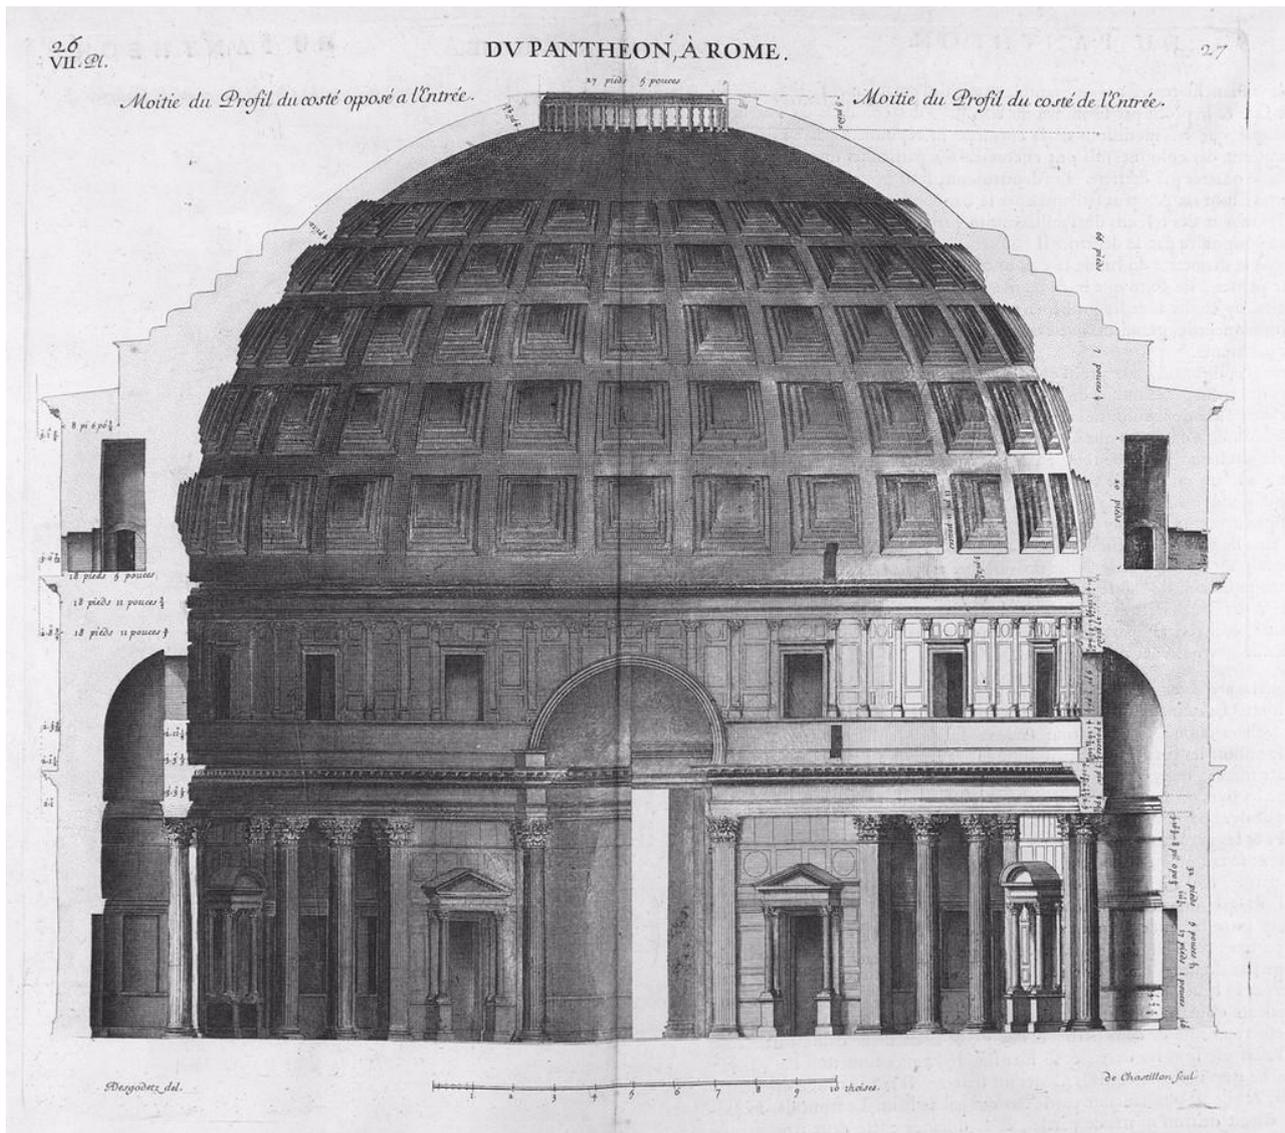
Antoine Desgodetz, half sections of the Pantheon, to the center left through the apse at the south end, to the center right through the entrance door at the north end. (From *Les Edifices Antiques de Rome dessinés et mesurés très exactement*, Paris, 1682).
